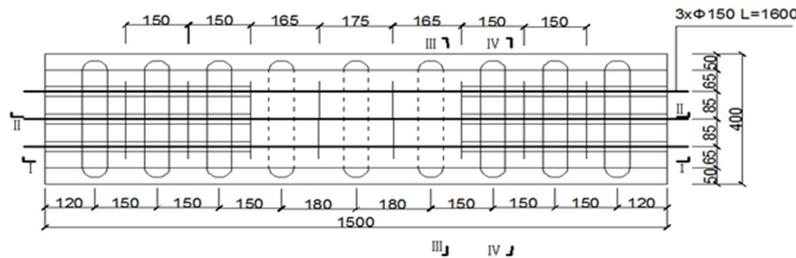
Layout of lightweight aggregate concrete slab with core assembly
